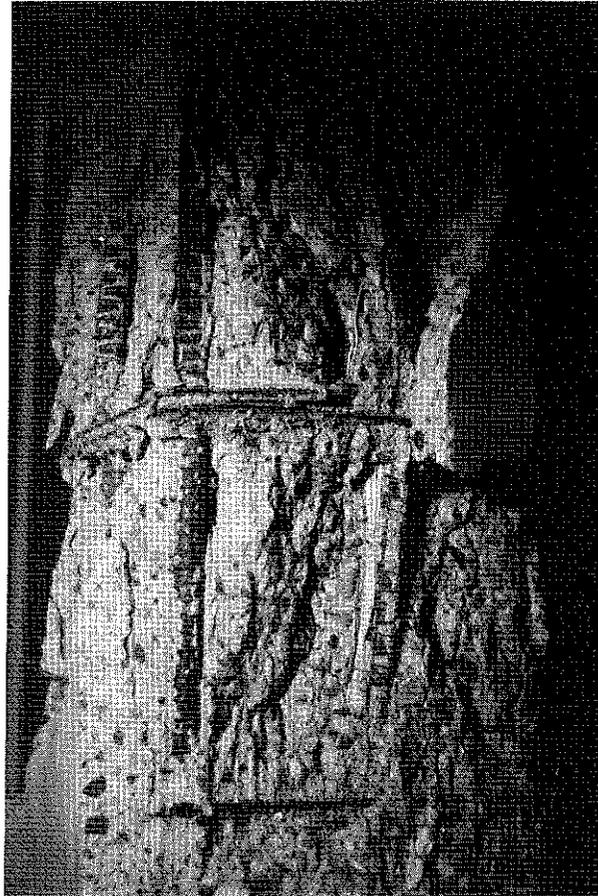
COLUMN NO. 3 (305 x 457 mm) AFTER TEST
